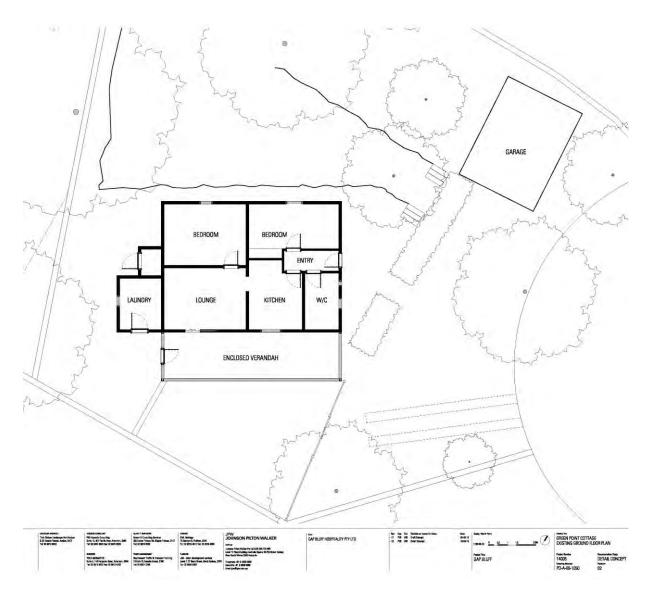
Floor plan, Green Point Cottage. (Source: JPW 2015)
